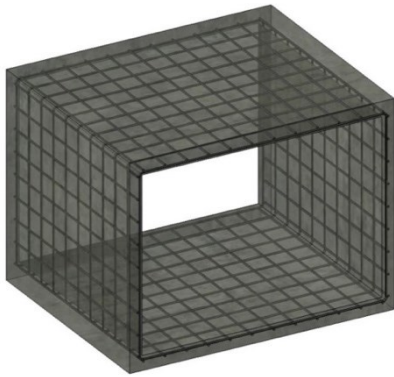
CAD drawing of rebar plan for precast reinforced sections (BYU, 2015)
